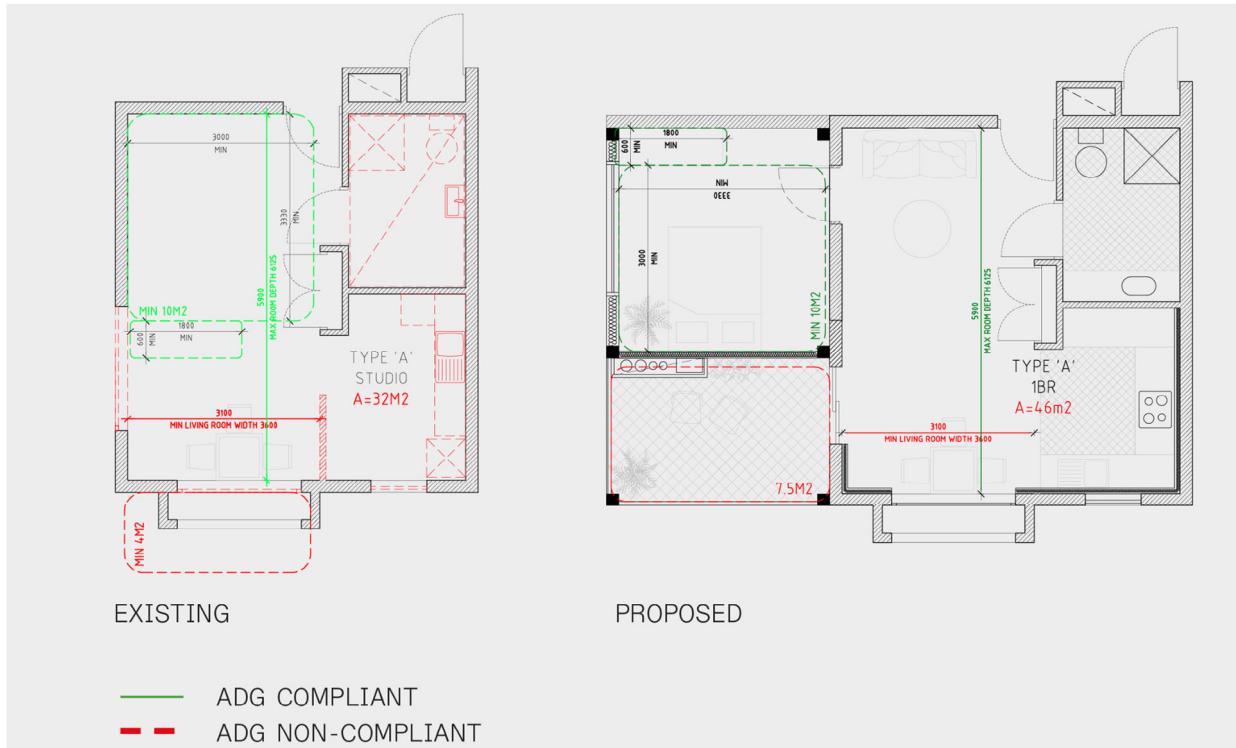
Proposed Tower Type A unit layout showing full compliance with ADG except for the balcony size and living room width.
